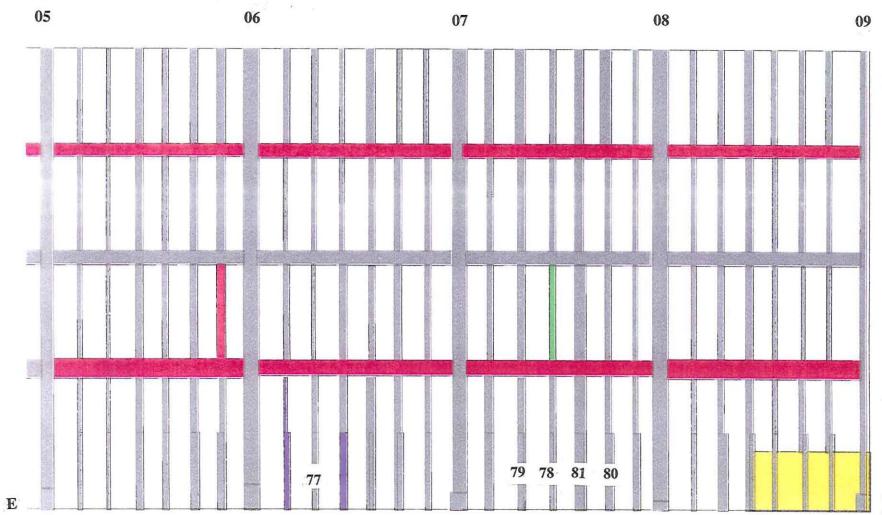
(1): South elevation of choir roof (eastern half) to show sample locations
